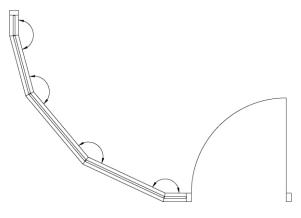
Examples of angle connection of AVL construction - horizontal cross-section through designed wall with doors.
